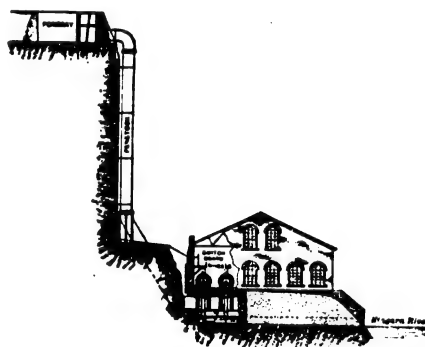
CROSS SECTION OF POWER HOUSE OF NIAGARA FALLS HYDRAULIC POWER & MANUFACTURING COMPANY.
